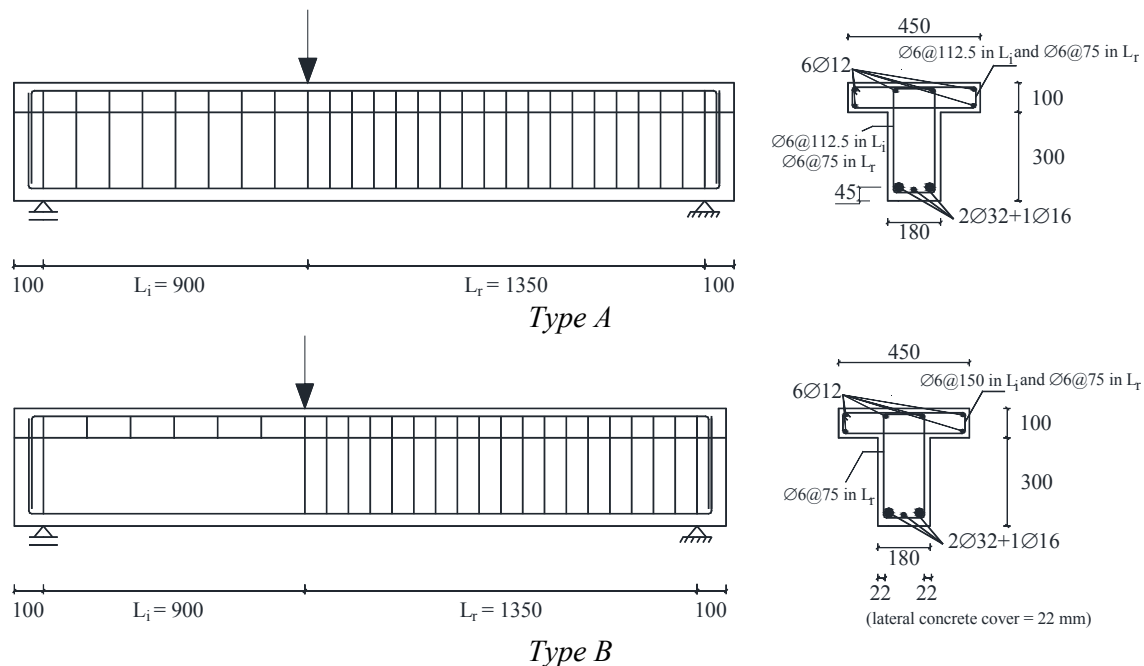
Geometry and reinforcement arrangement of the concrete beams (dimensions in mm)
